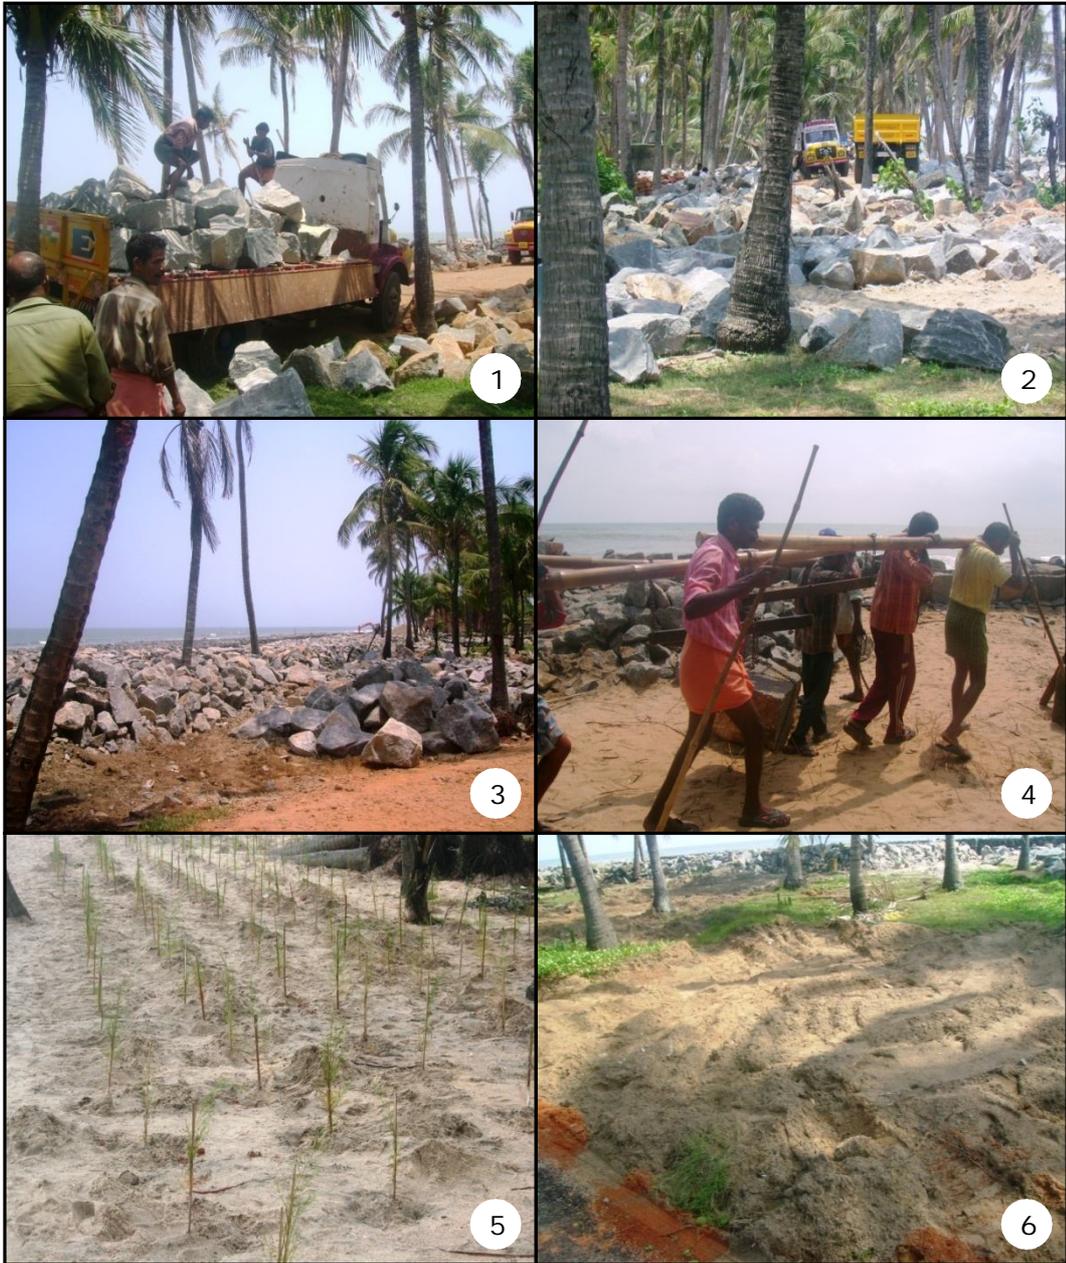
1-4. Different stages of sea wall construction. 5 & 6 The planted area before and after sea wall construction.
